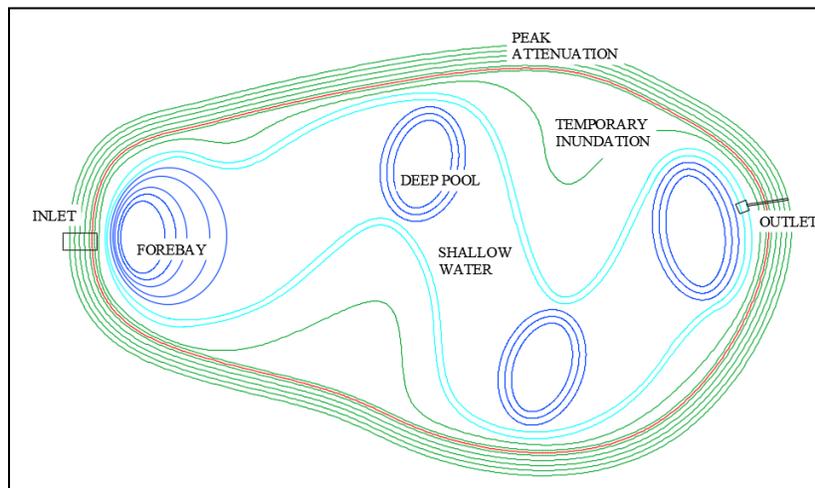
Typical layout of a stormwater wetland, including different zones for treatment.
